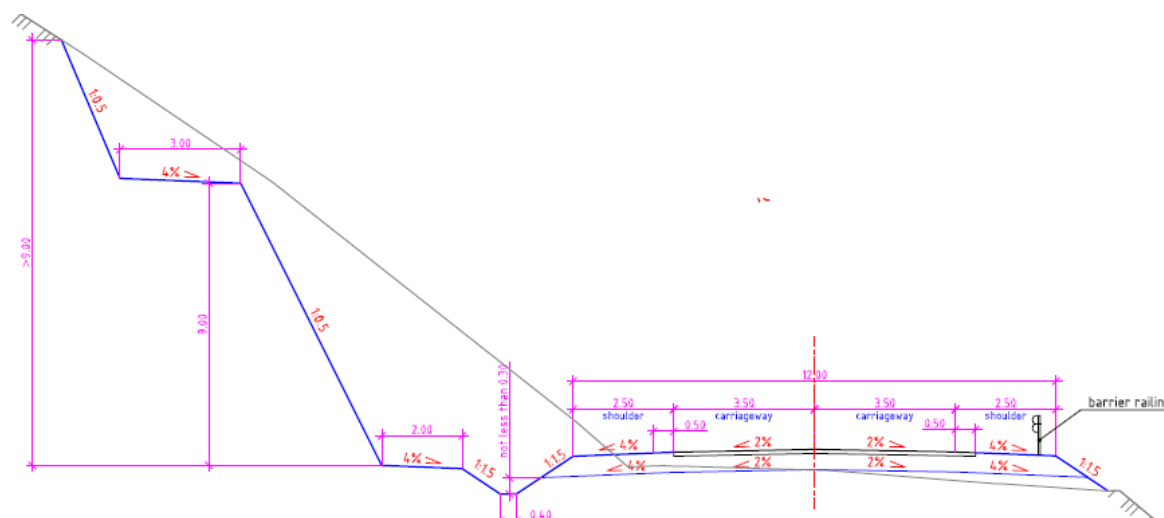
Typical cross section in rural area (category III) of Dangara-Okmazor road section in cut sections km 40.0 - km 68.7
